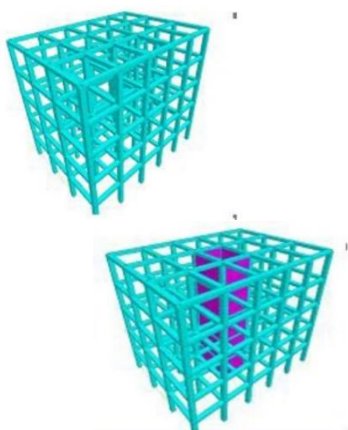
Frame 1) No shear walls, Frame 2) Shear walls at the core
